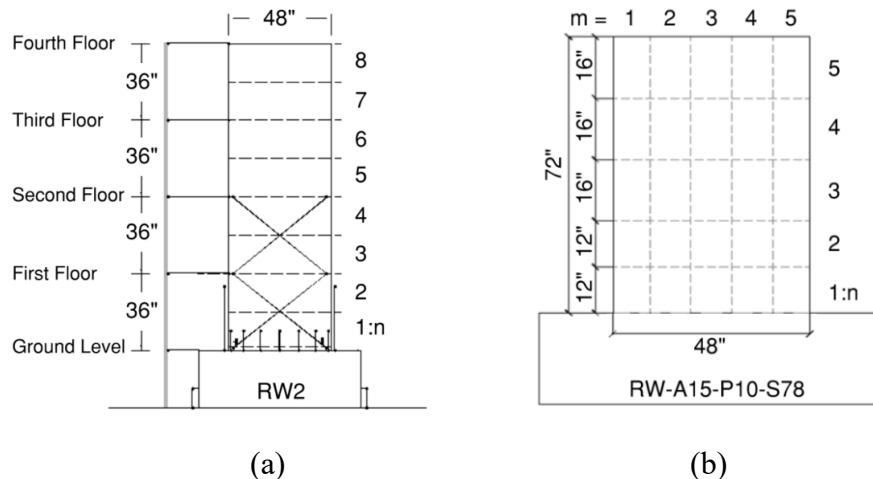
Elevation of wall specimens: (a) Specimen 1 (Thomsen & Wallace 1995); (b) Specimen 2 (Tran & Wallace 2012)
